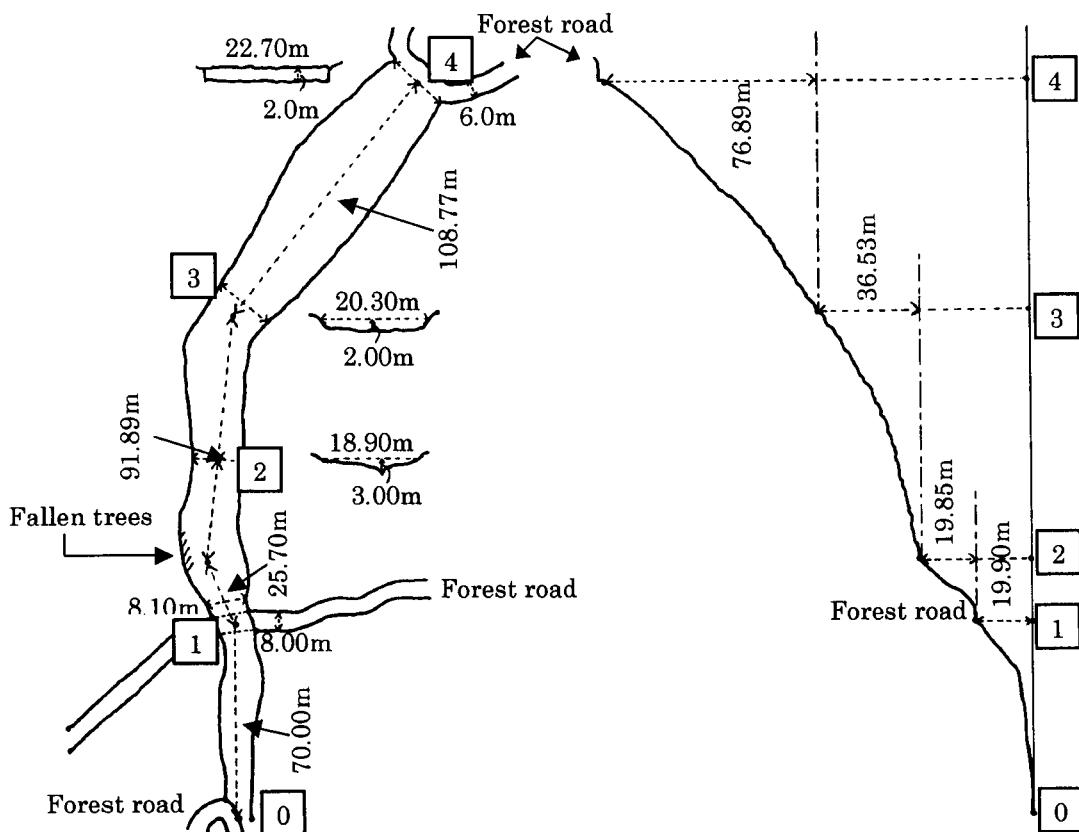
Plan and longitudinal section of the failed slope in Kamiyahagi Town.
